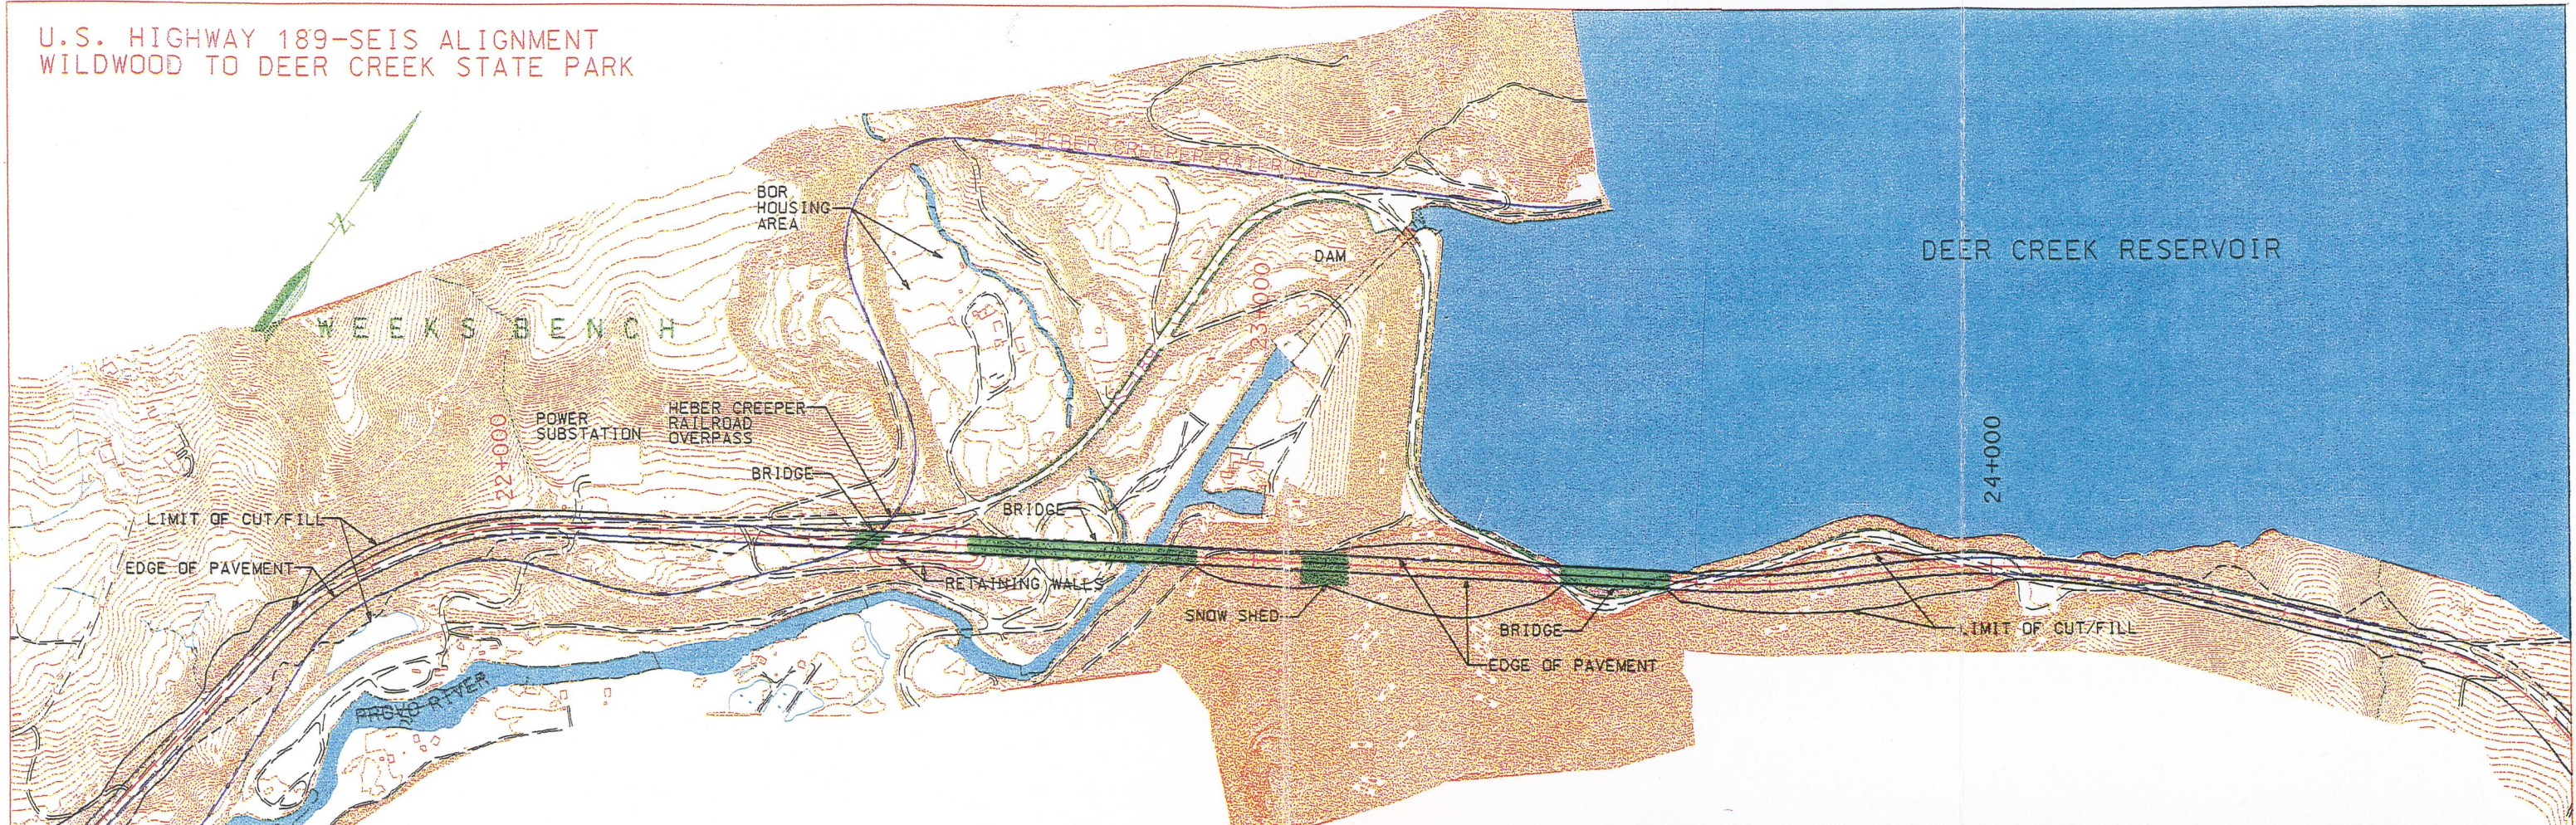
Section 2 of Wildwood to Deer Creek State Park Segment, Provo Canyon Highway Improvement Project.
